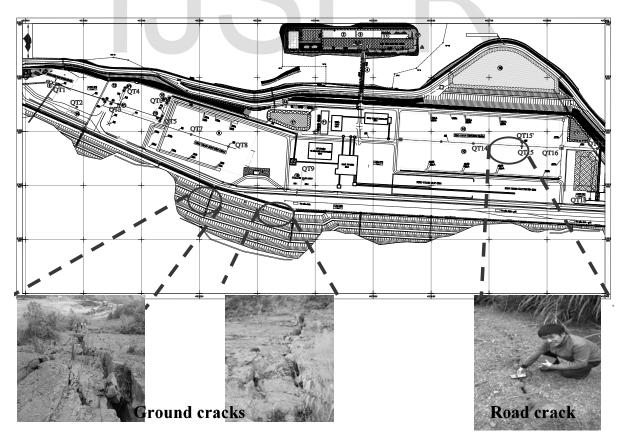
Khe Cham washing plant and the photographs of ground cracks and road cracks due to mining activities. The photos were taken on 24-02-2016
